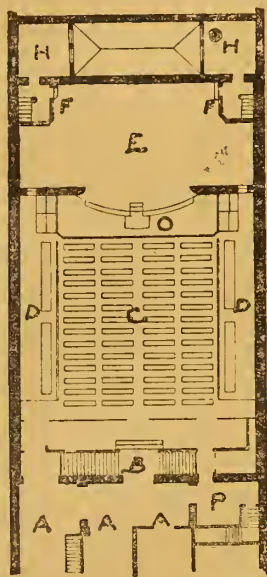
A, entrance and exits; B, gallery stairs; C, stalls; D, side stalls and promenade; E, stage; FF, dressing-room staircases; HH, dressing-rooms; O, orchestra; P, buffet.
